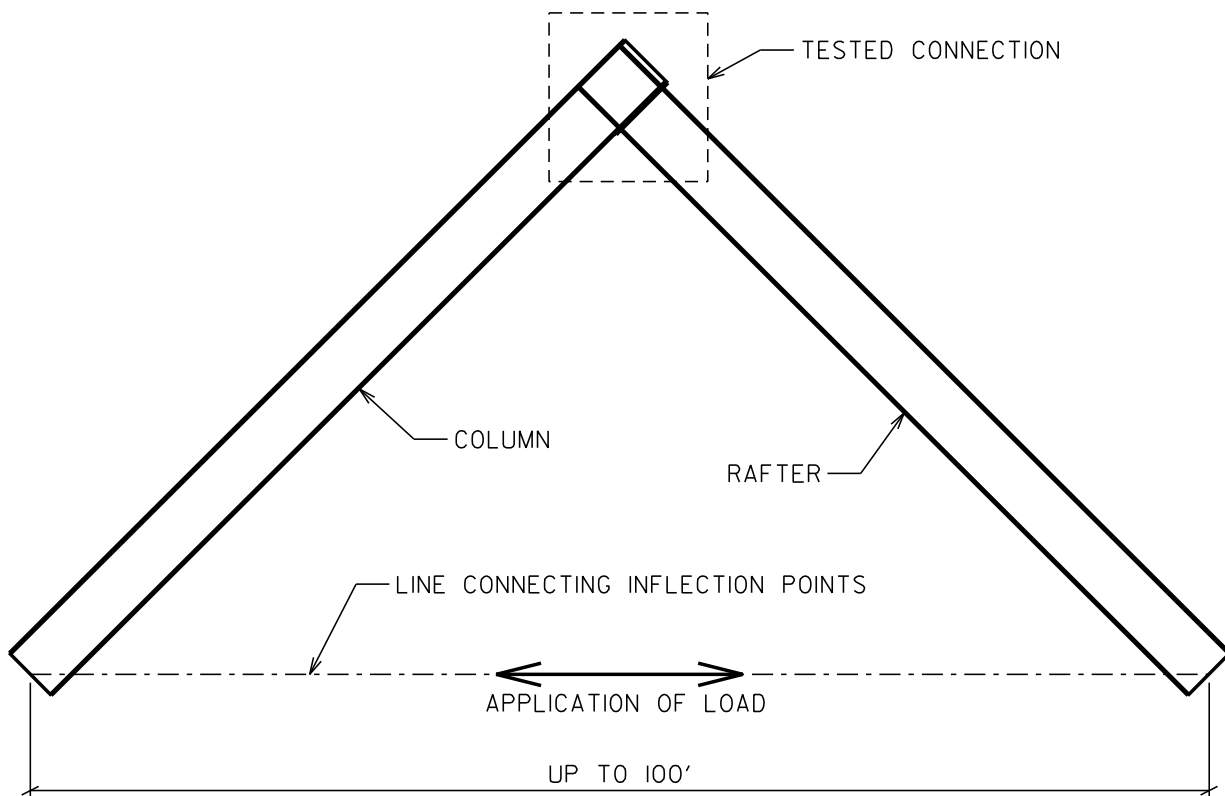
GABLE FRAME TEST SPECIMEN
